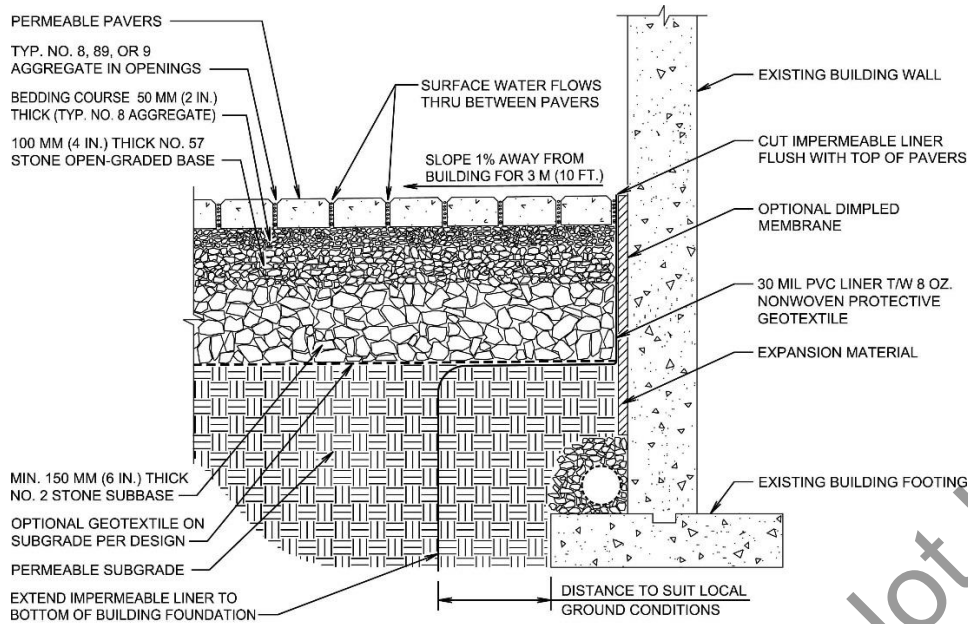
Example Foundation Wall Protection from Water Infiltration
